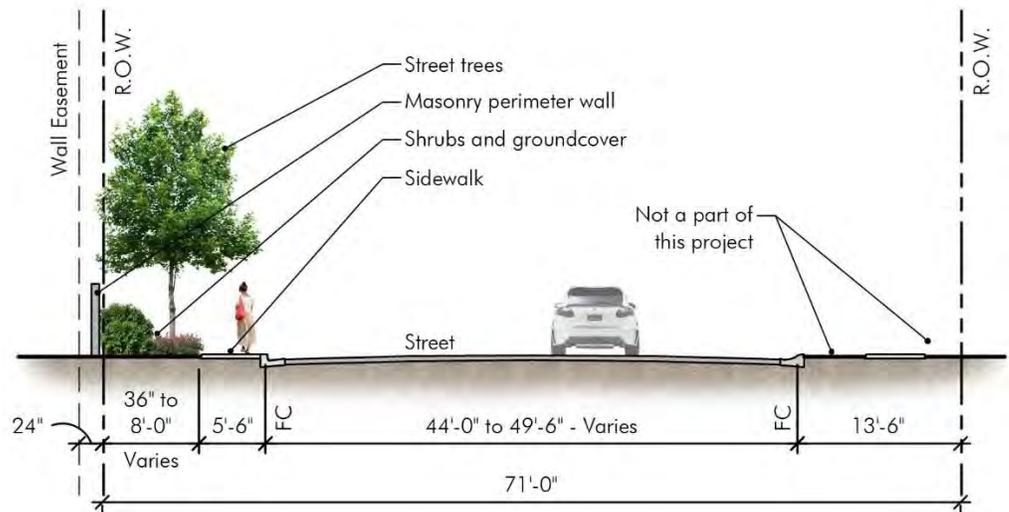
South Stockton Street – North of Street D (looking north)
